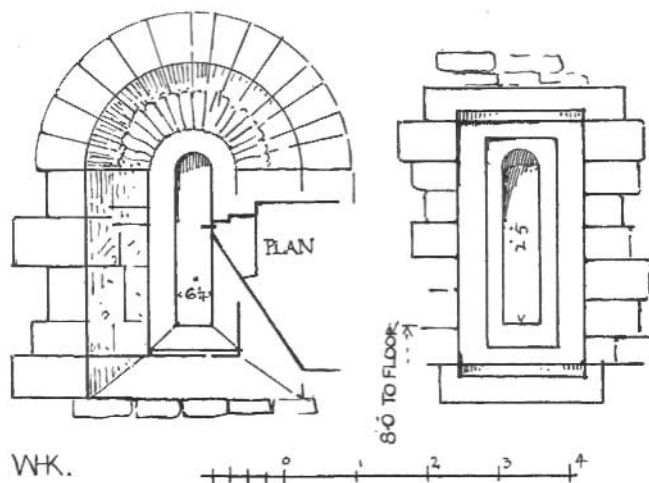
WINSTONE: WINDOW IN NORTH WALL OF NAVE
